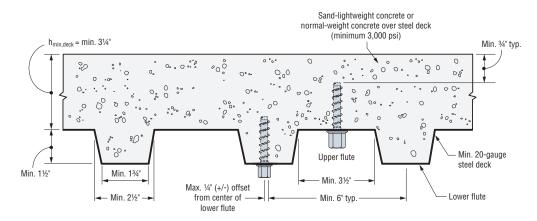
THDB25158RH and THDB37158RH Installation in Concrete over Steel Deck
